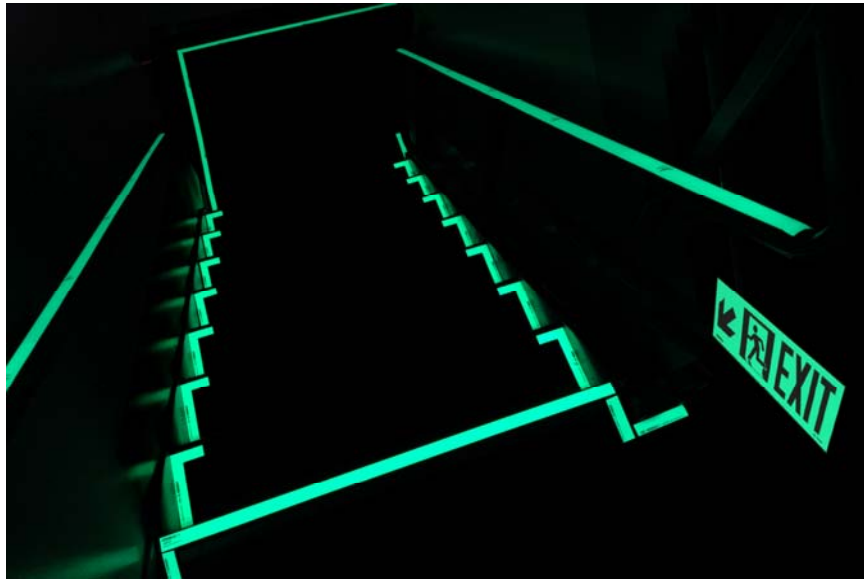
A typical NYC RS 6-1 photoluminescent stairwell egress system installation
